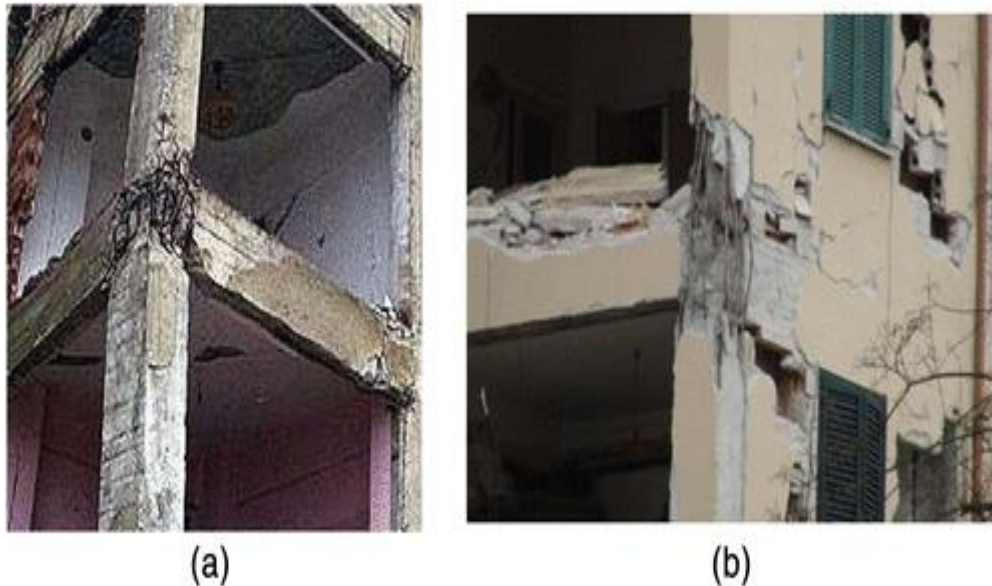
Failure at the beam-column joint due to large shear forces and bending moment in the loaded corner
